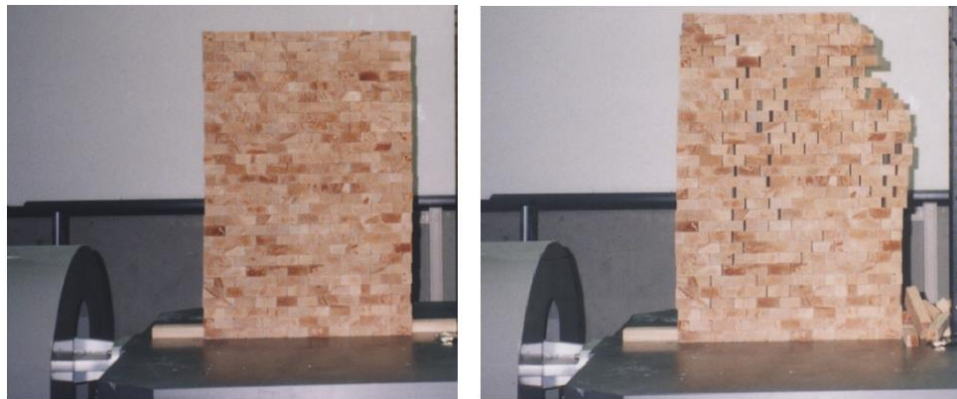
Views of the wall with 30 layers of wooden blocks before and after shaking
